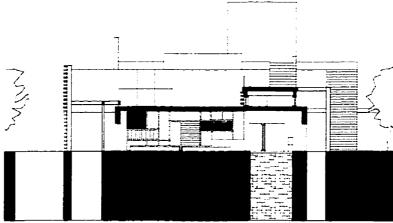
Section 4. A lower waiting area is defined by concrete floors and wooden benches. This space provides the person with limited views into the Zen garden.
